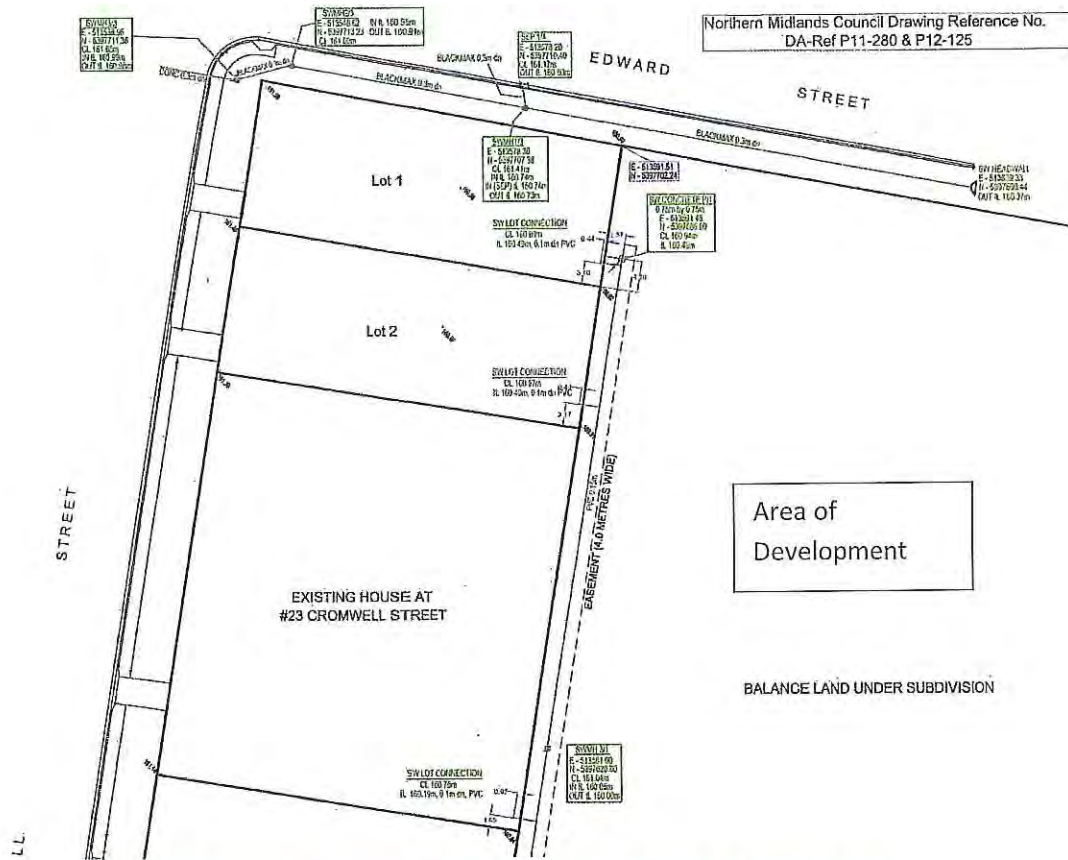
, Council Stormwater Services plan for C.T.168360-301.
